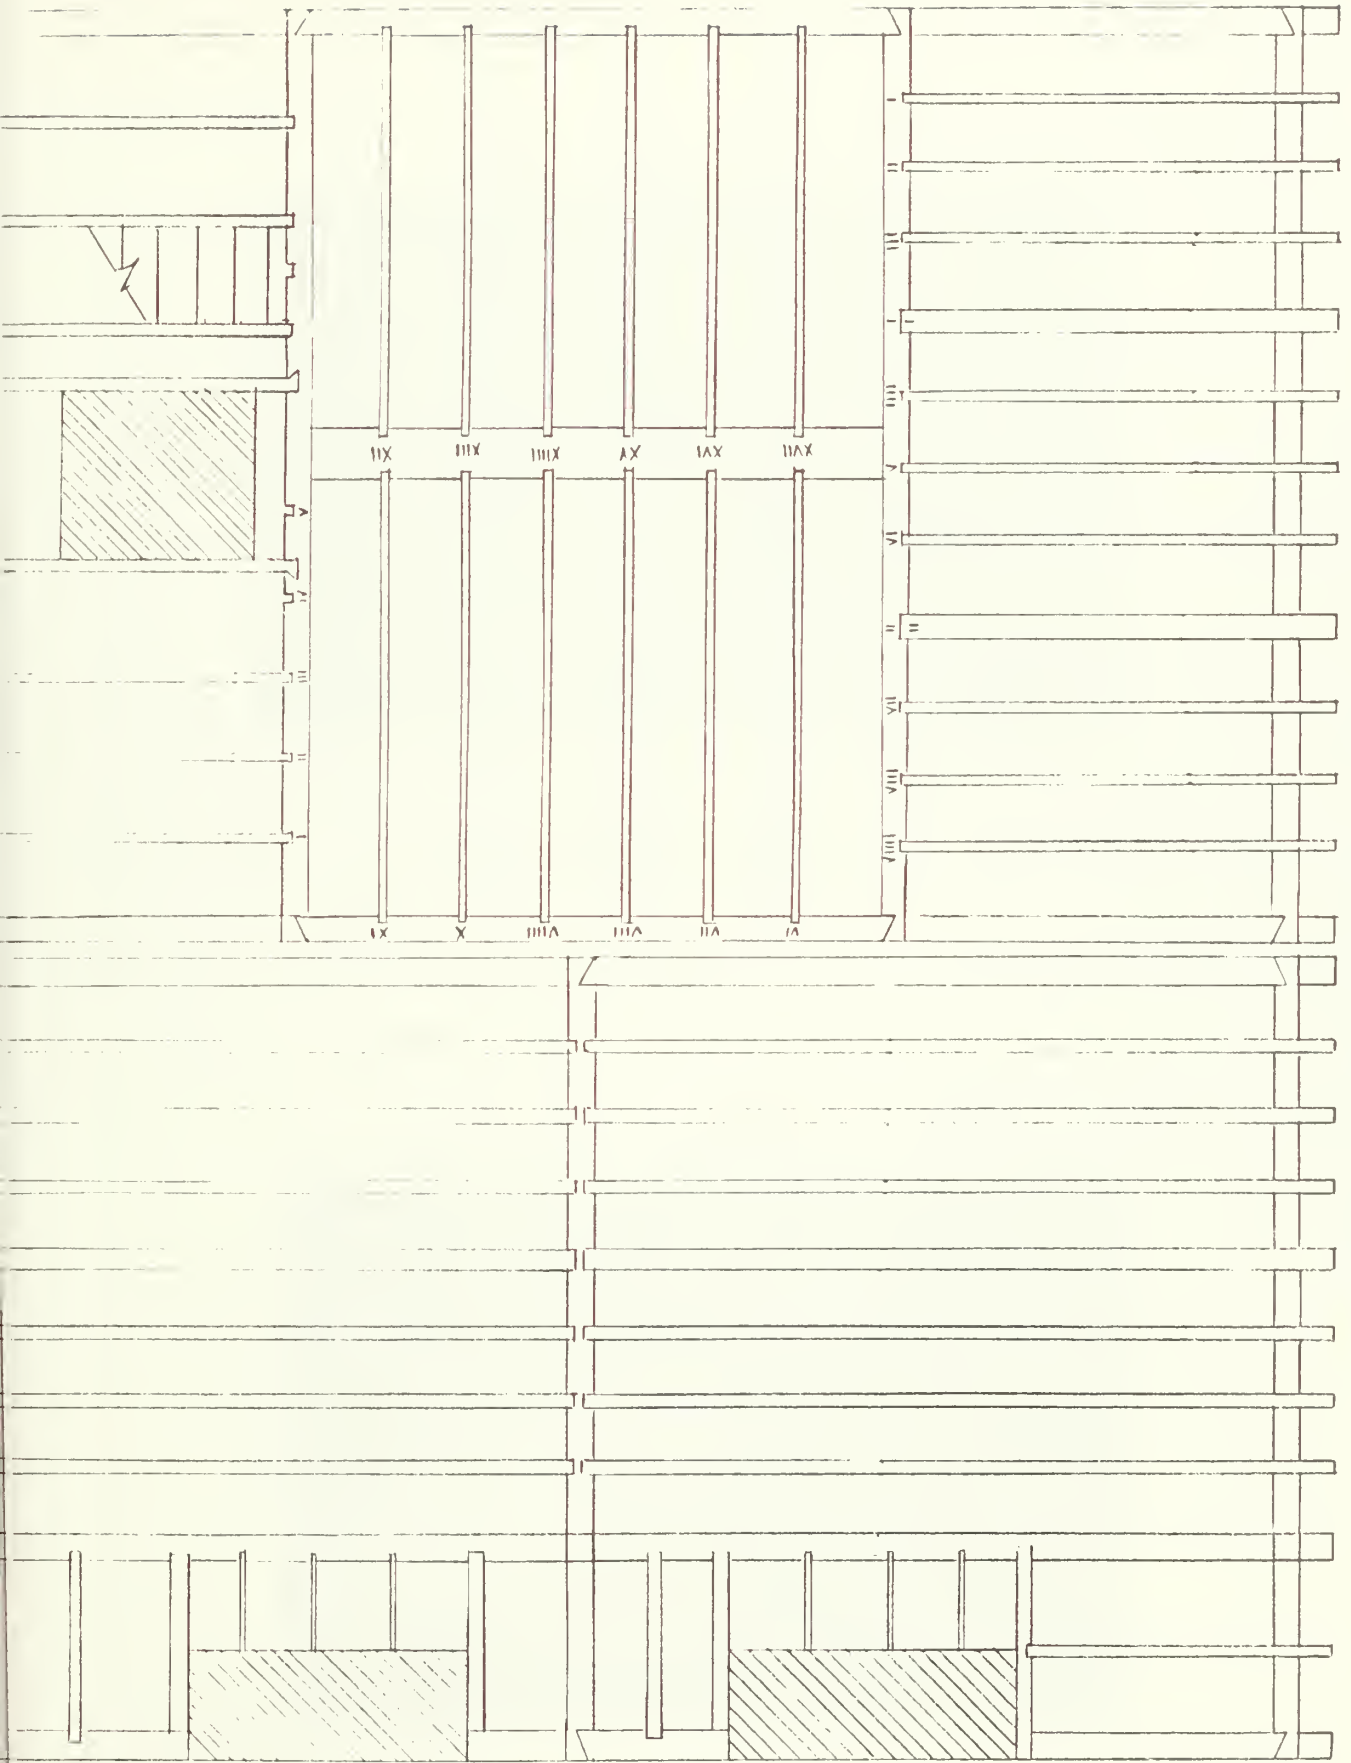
Antram-Gray House: Attic-Floor Framing Plan. Scale 1/4" = 1'-0"
